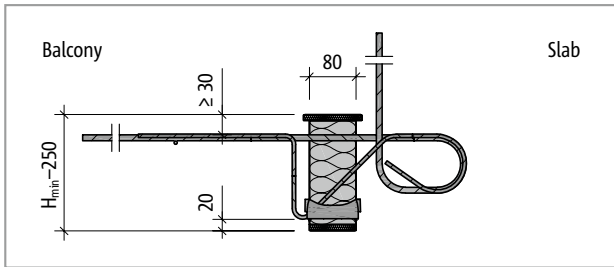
Schöck Isokorb® T type K-WO: Product section
